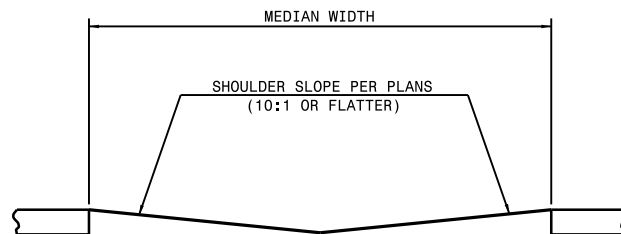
DETAIL OF MEDIAN TREATMENT AT UNDERPASS
